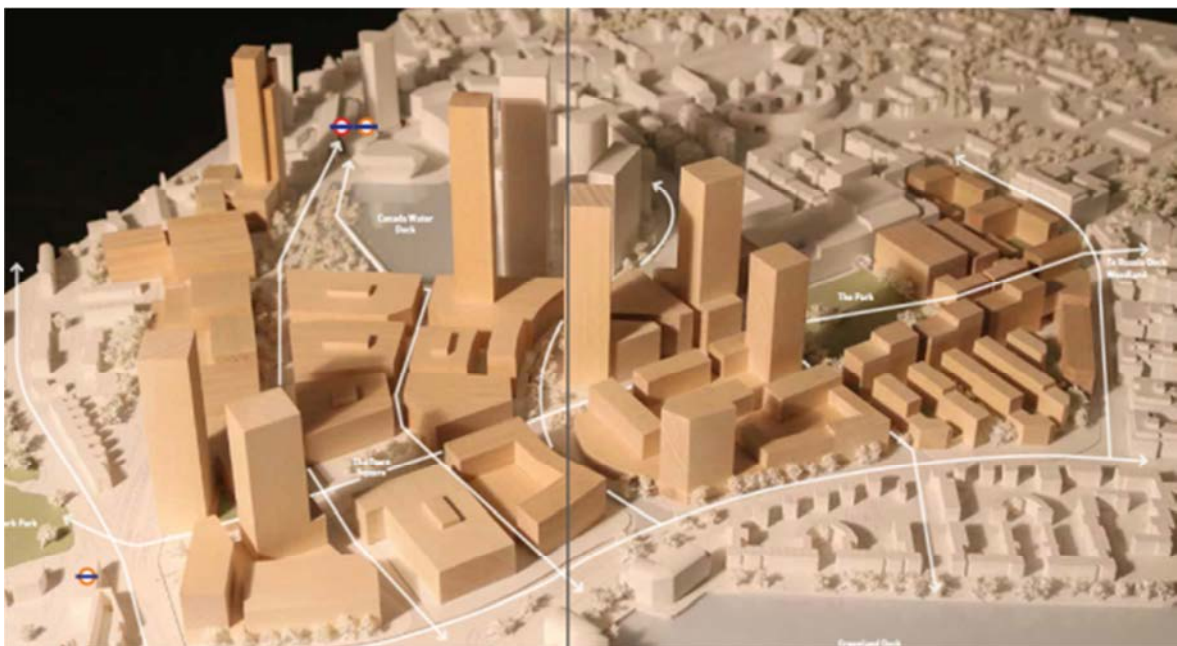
Illustrative Masterplan (as presented in DAS at submission)
